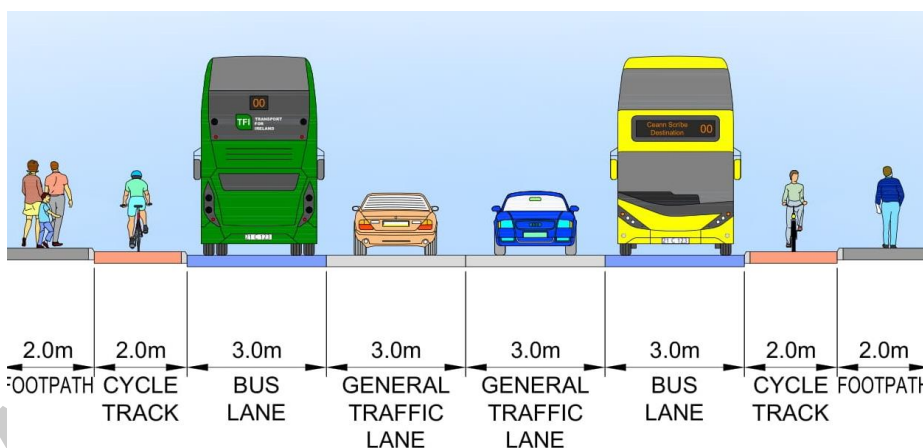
Section 2, Proposed Option 4b – Cross Section A-A
